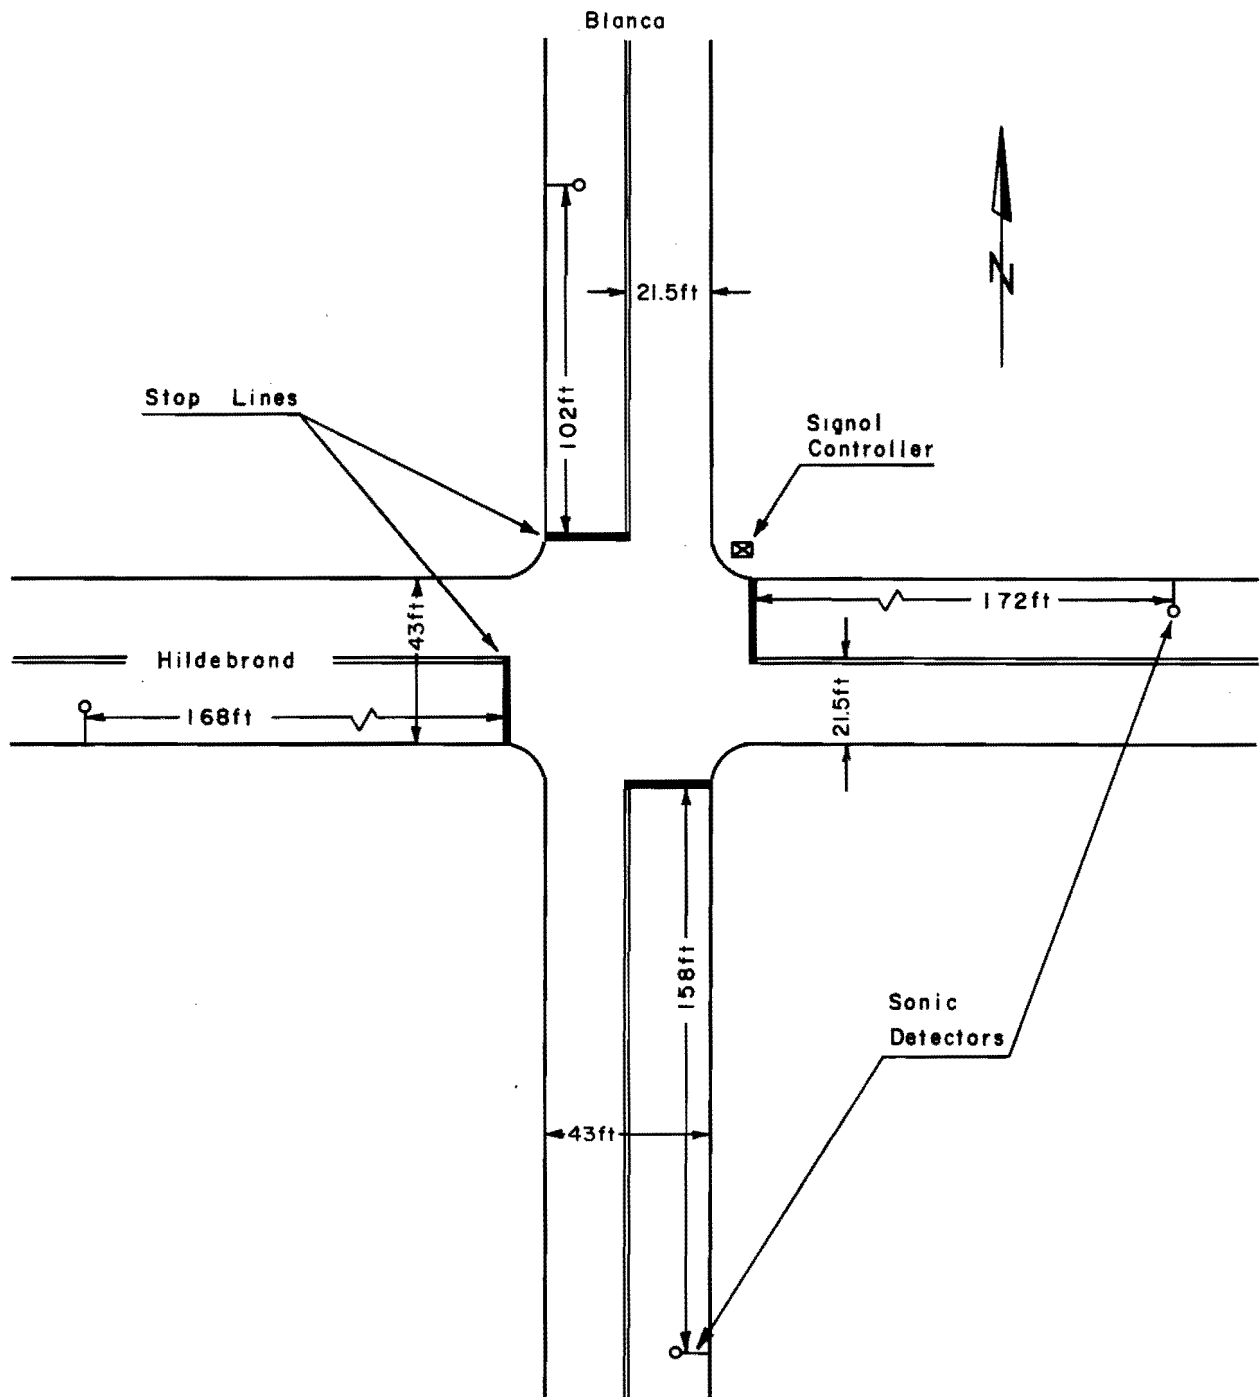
Geometric layout of Hildebrand and Blanco intersection (signalized).
